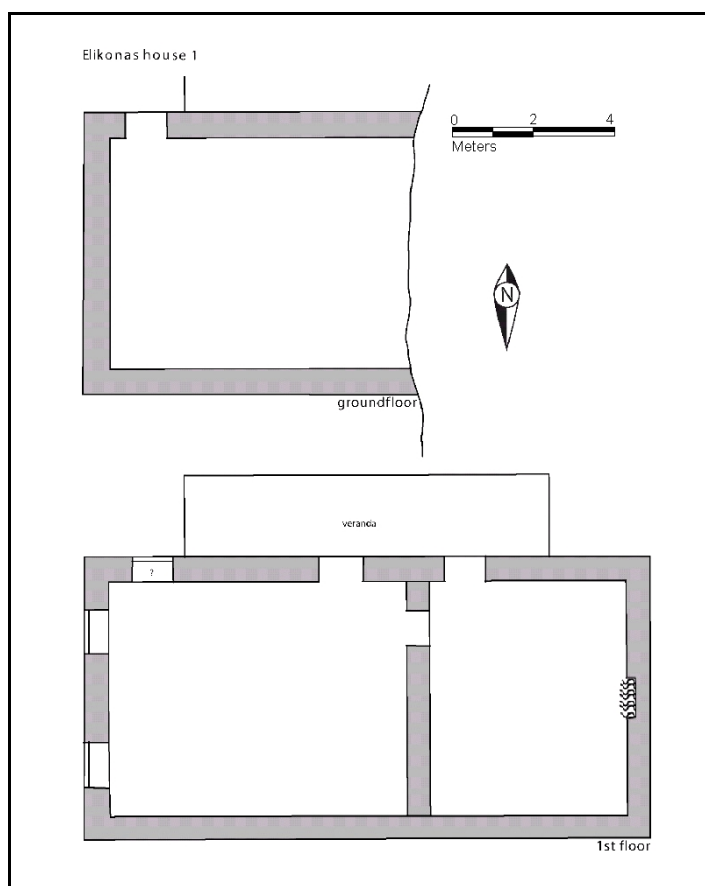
Plan of the 1½ storey house 1 at Elikonas.
